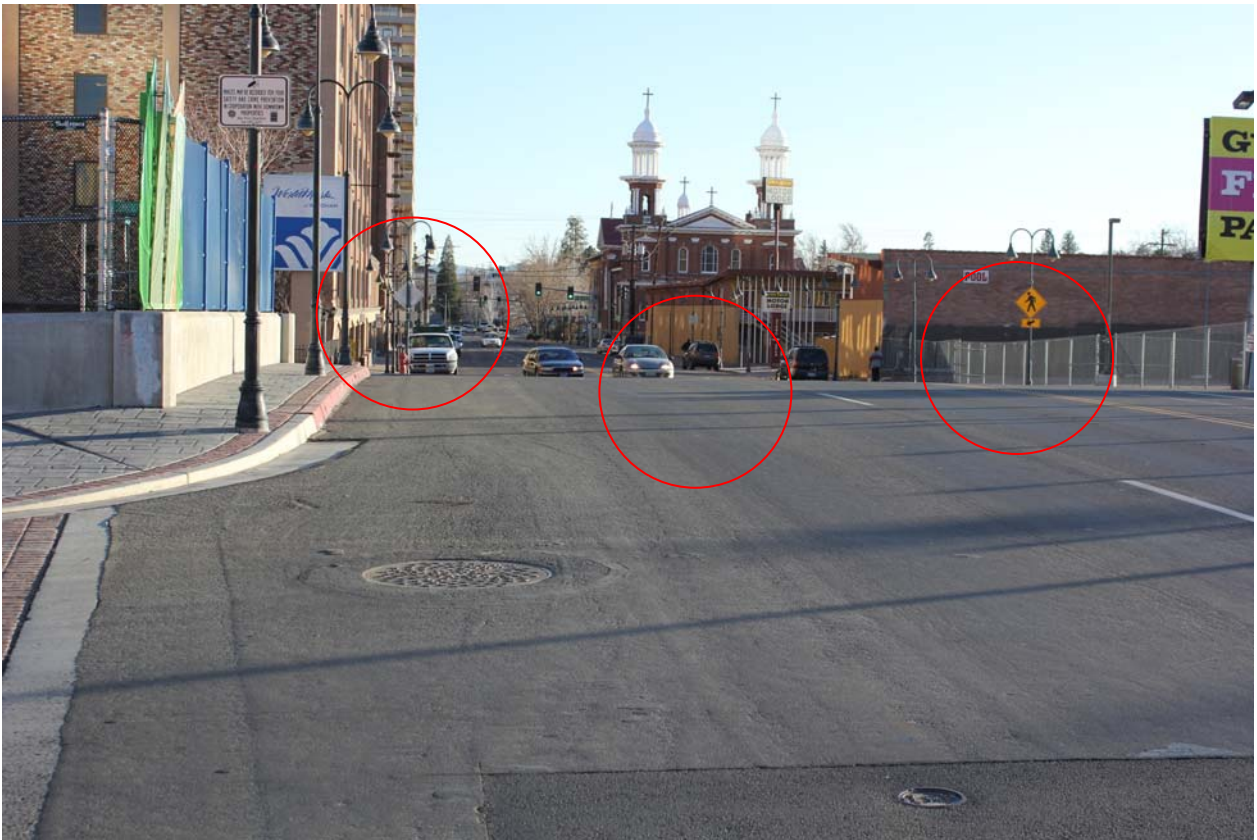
Looking southbound on Arlington Avenue at the intersection of Commercial Row from the intersection of 3rd Street.
